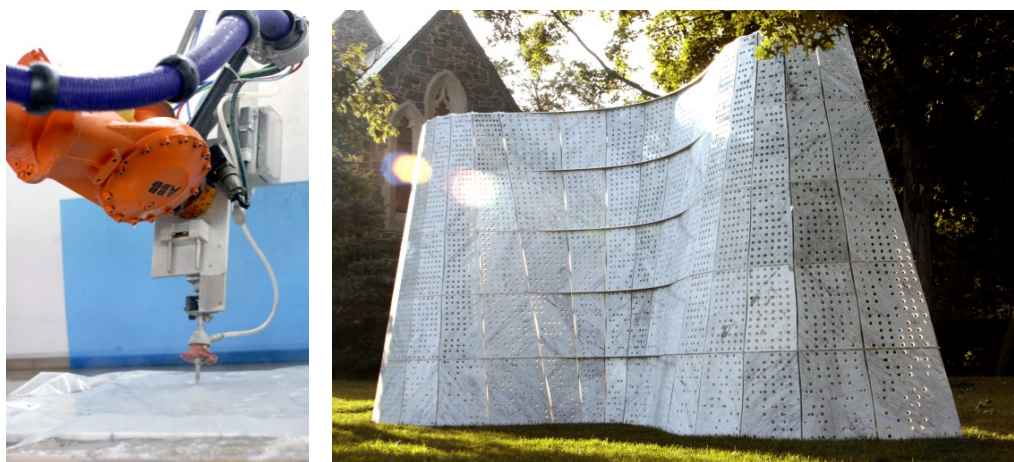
Surfacing Stone: (left) robot applied as a water jet cutting machine; (right) wall assembled out of individually formed and perforated marble plates.
